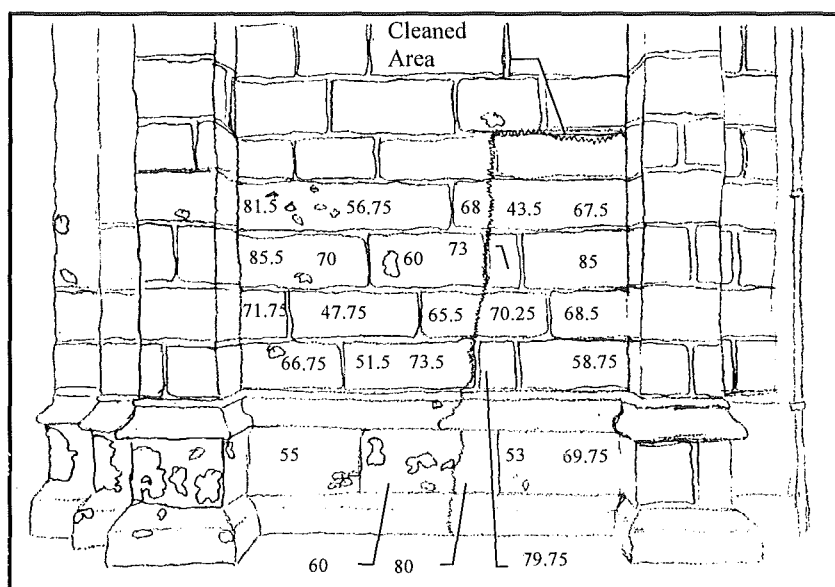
Sketch plan for Lydford church, south facing wall.
